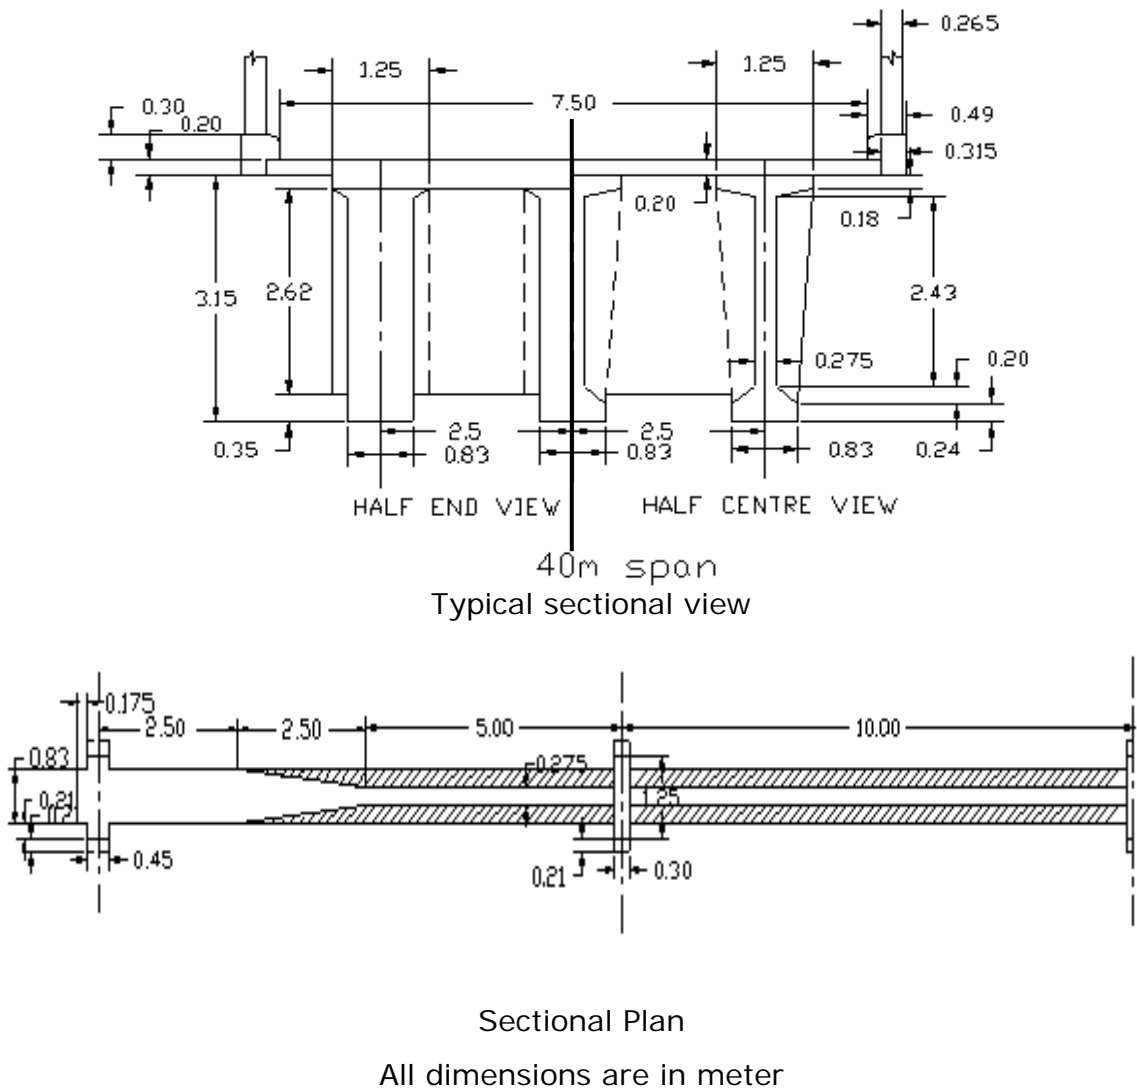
TYPICAL SECTIONS AND PLAN OF SUPERSTRUCTURE OF SPAN 40m (AS PER MOST)
